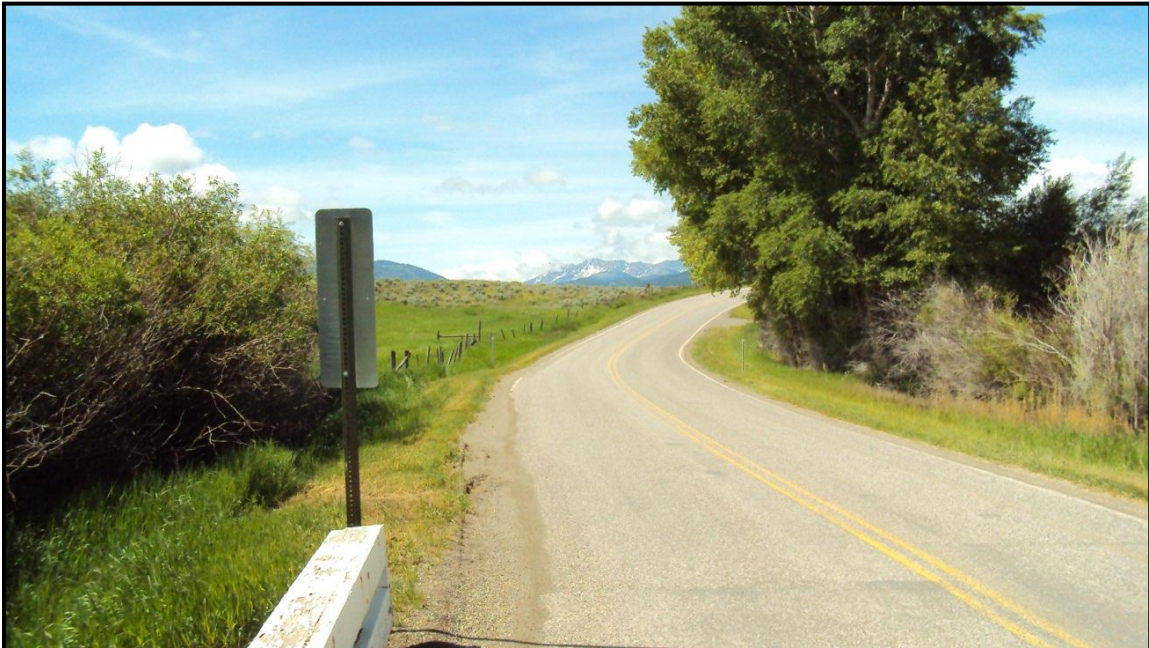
Looking at a damaged bridge crossing Carrol Creek. RP 27.1.
